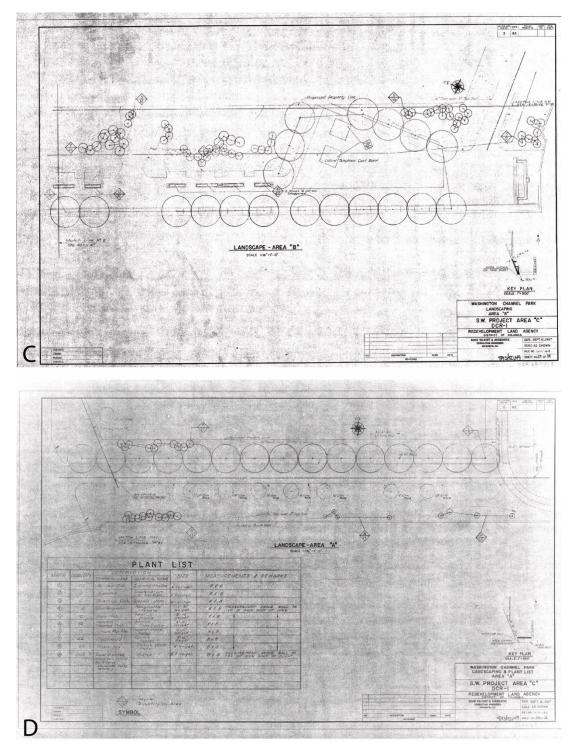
d: The 1967-1968 planting plan features a simple planting plan in keeping with Modernist landscape principles. (C) The south play area and Titanic Memorial sculpture plaza; (D) the former P Street SW walkway. ("Park Improvement Plan," TIC 823/80029, Sheet 5, NCA)
